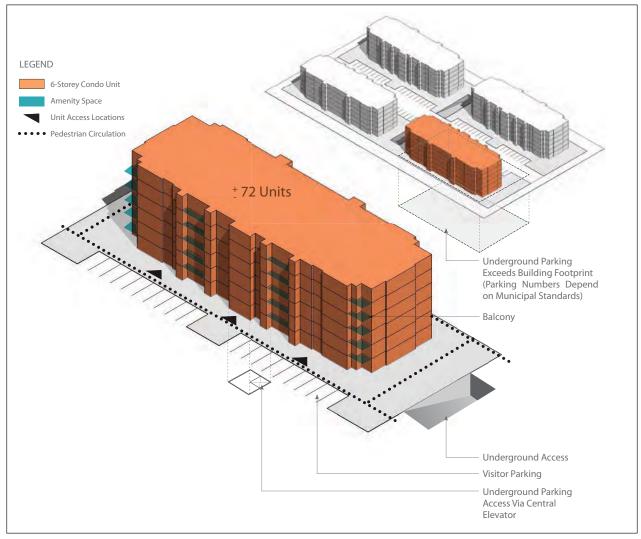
Conceptual massing of a 6 storey mid-rise condominium with underground parking. Building heights from 6 to 8 storeys will be permitted. Options for lower or higher storeys may be considered, subject to site context.
